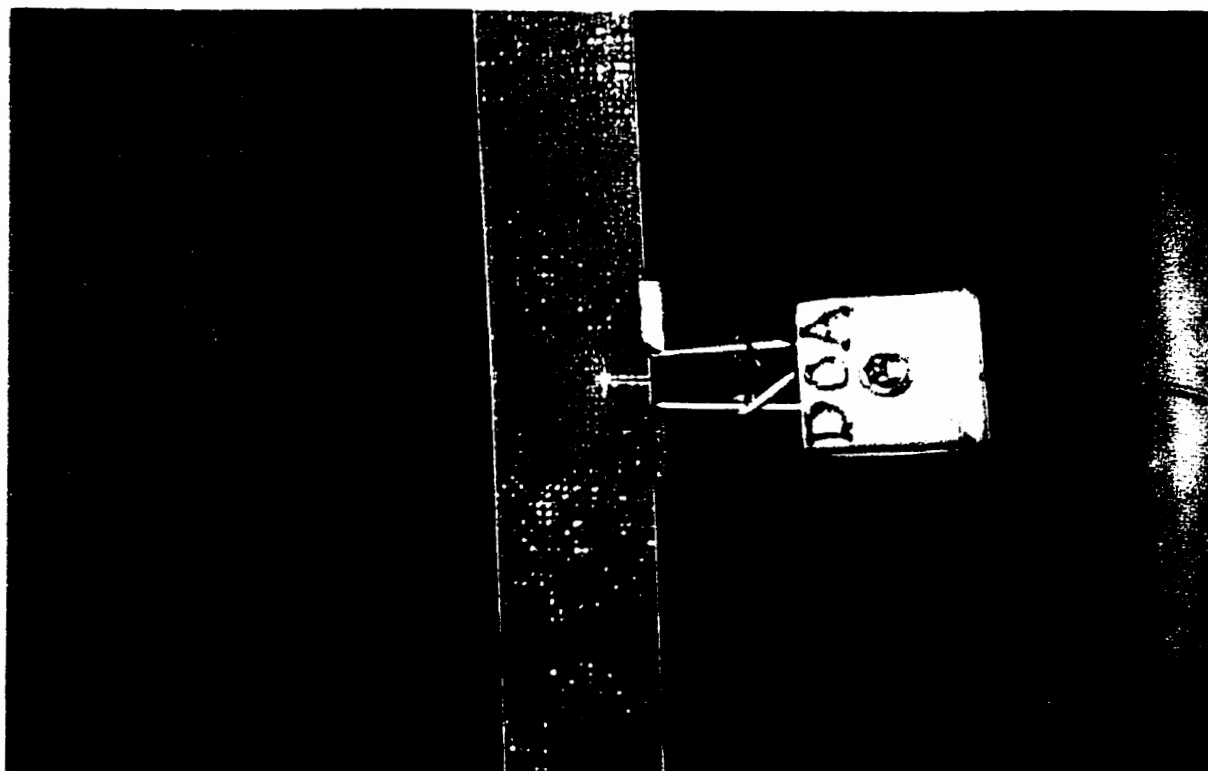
Specimen of Straight Crack under Testing and the Fracture Zone Starting in Front of the Crack Tip.
